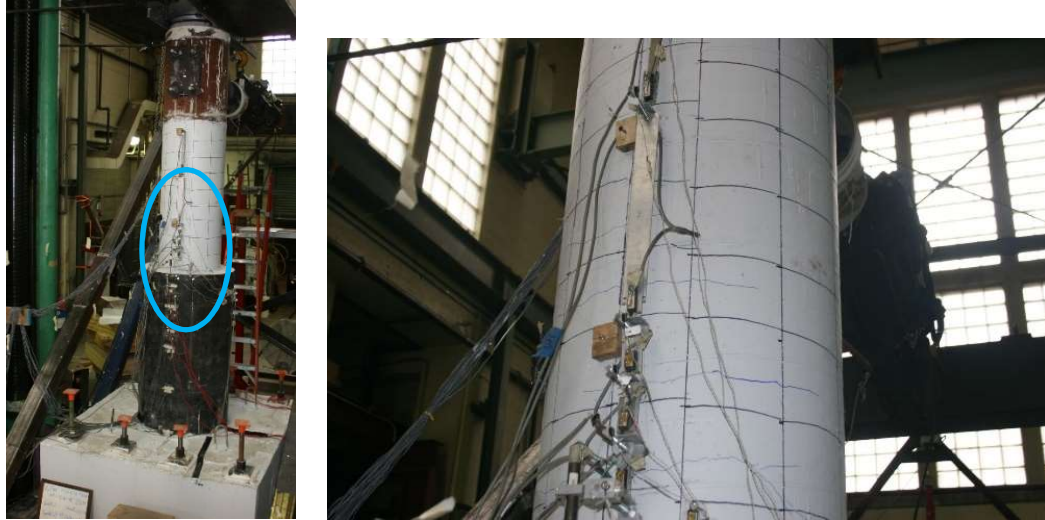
Specimen 30-21-R Horizontal Cracks on Northern Column Face at 0.8% Drift
